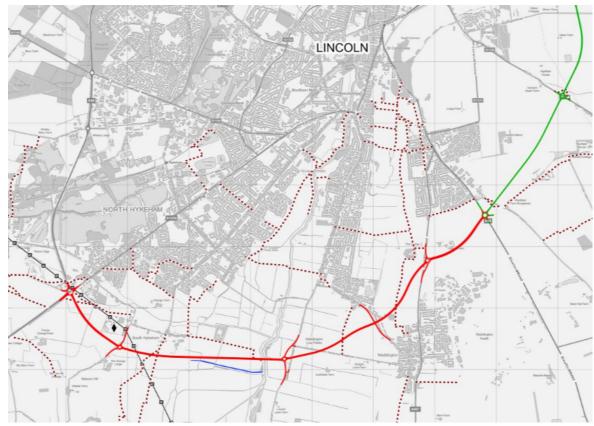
Location Plan, NHRR (Red), LEB (Green)
